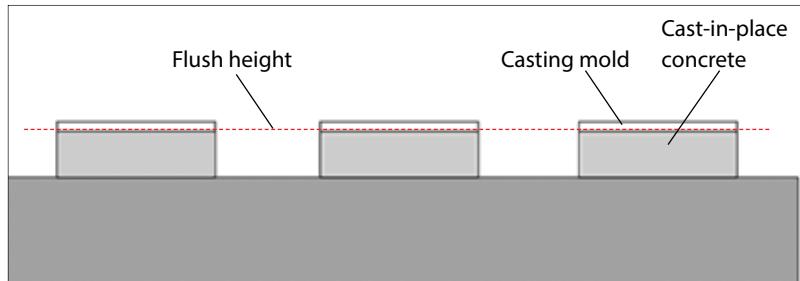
3 (casting up the concrete foundations to the same height)
